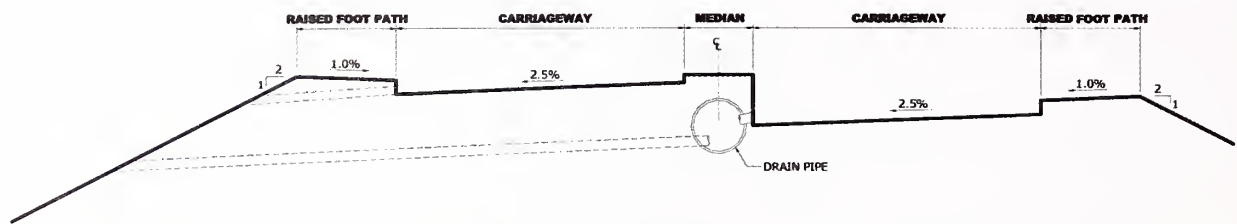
A Typical Cross-Section with a Staggered Camber in a Divided Carriageway
